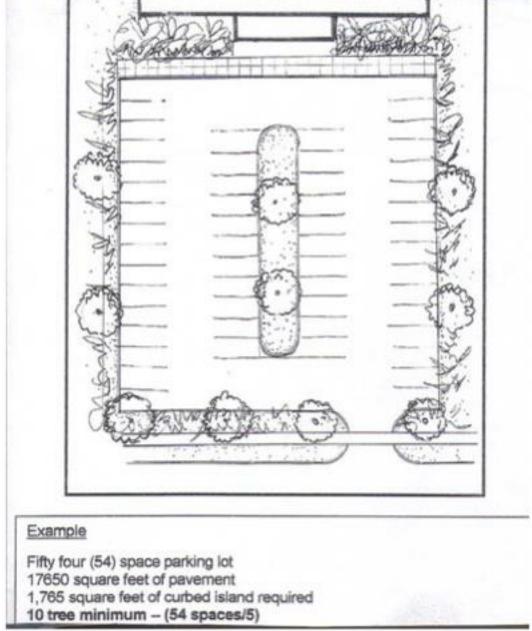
Internal and Perimeter Landscaping for Parking Areas
